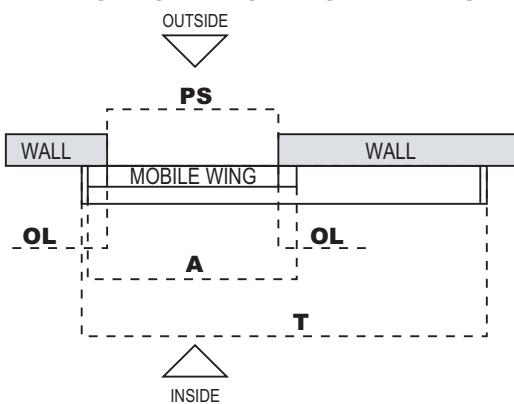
SINGLE DOOR AUTOMATION - SIT. B : LEFT OPENING - WITH A TRANSVERSE WALL
